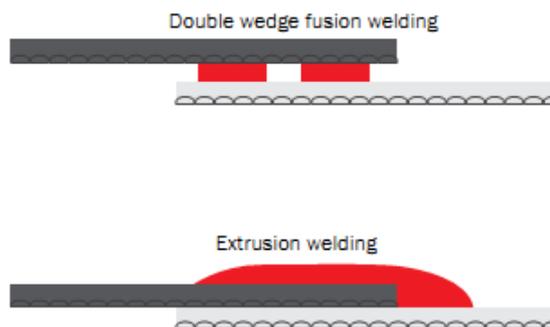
Double wedge fusion welding and extrusion welding
